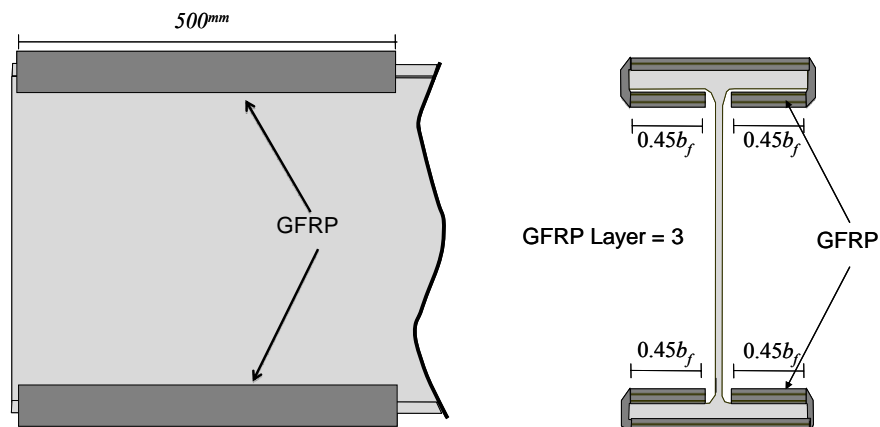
GFRP Layout of HE500AA GFRP1 Beam
